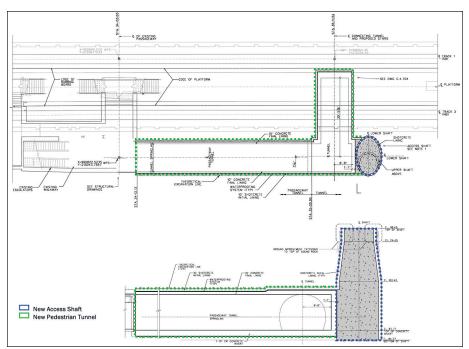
Plan view (top) and longitudinal section (bottom) of new passageway tunnel at Grand Central—42nd Street Station
